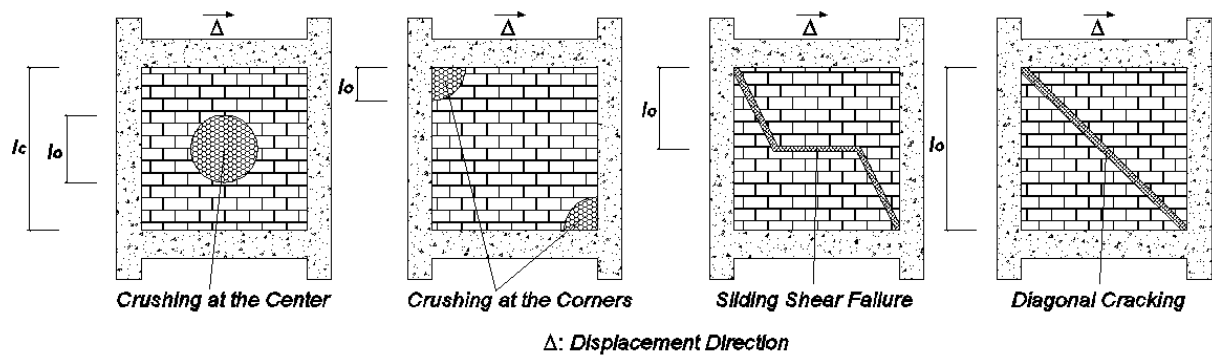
Typical Failure Patterns of Infill Walls/Panels
